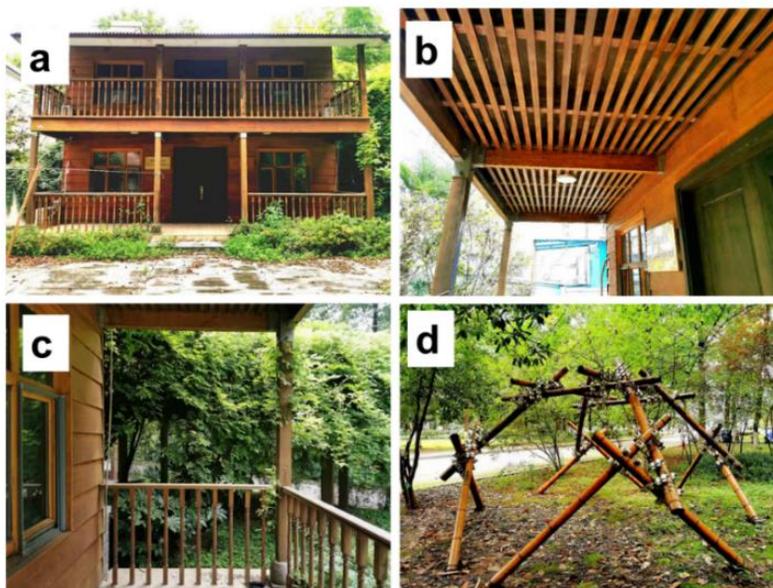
Bamboo use in buildings and structural construction: a) bamboo building, b) bamboo ceiling, c) bamboo exterior, and a d) bamboo structure (Location: Nanjing, Jiangsu Province).
